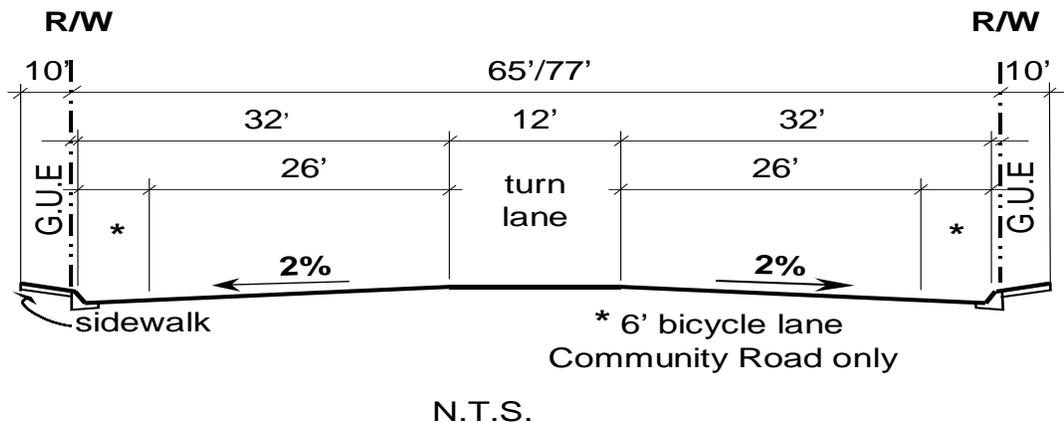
COMMERCIAL AND INDUSTRIAL COLLECTOR – TYPICAL SECTION
